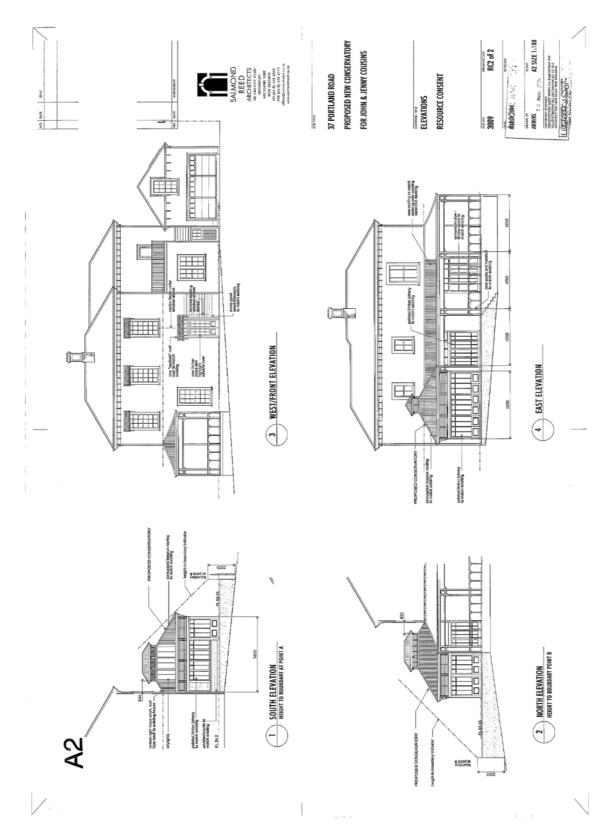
East and west elevations showing the proposed changes that involved the construction of a new conservatory, the extension of the verandah along the east elevation, and the replacement of windows with French doors (B/2004/6992 – Building Consent Plan – Res Alterations, Auckland Council property file: 37 Portland Road, Remuera).
